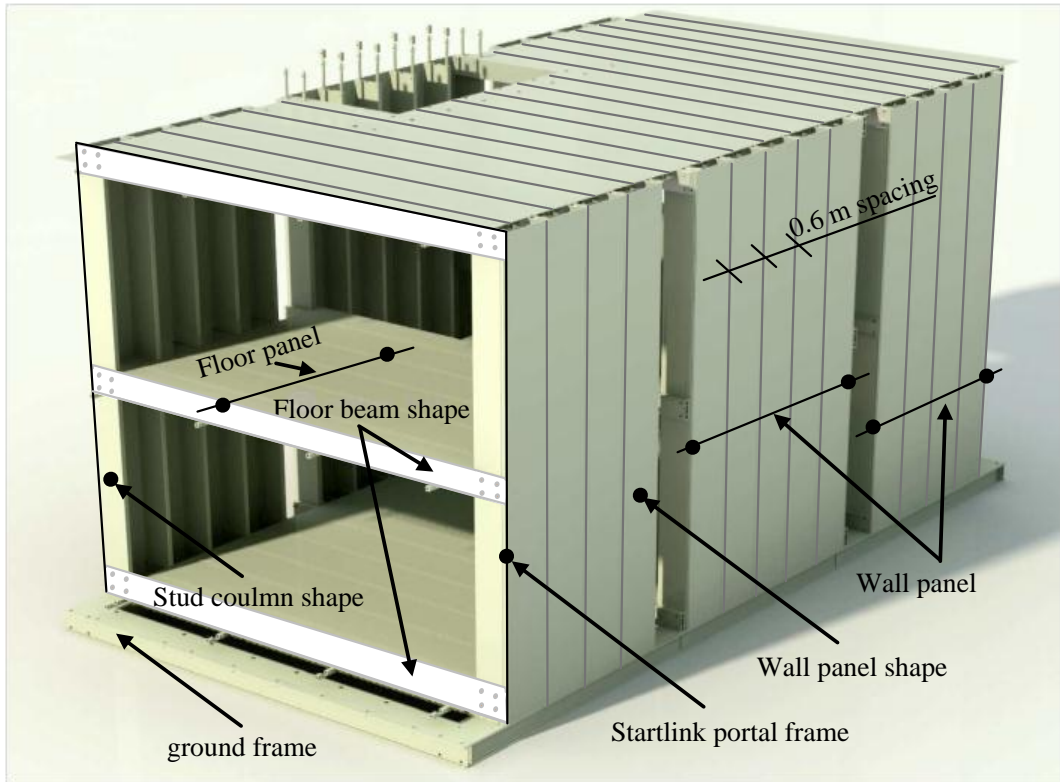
Floor and wall sub-assembly panels and two storey, single bay portal frame.
